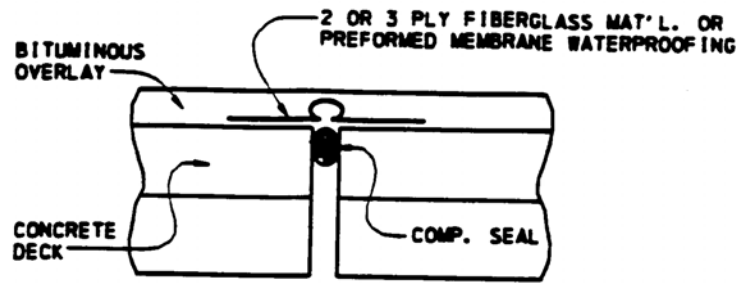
Deck Joint for Bituminous Overlays
